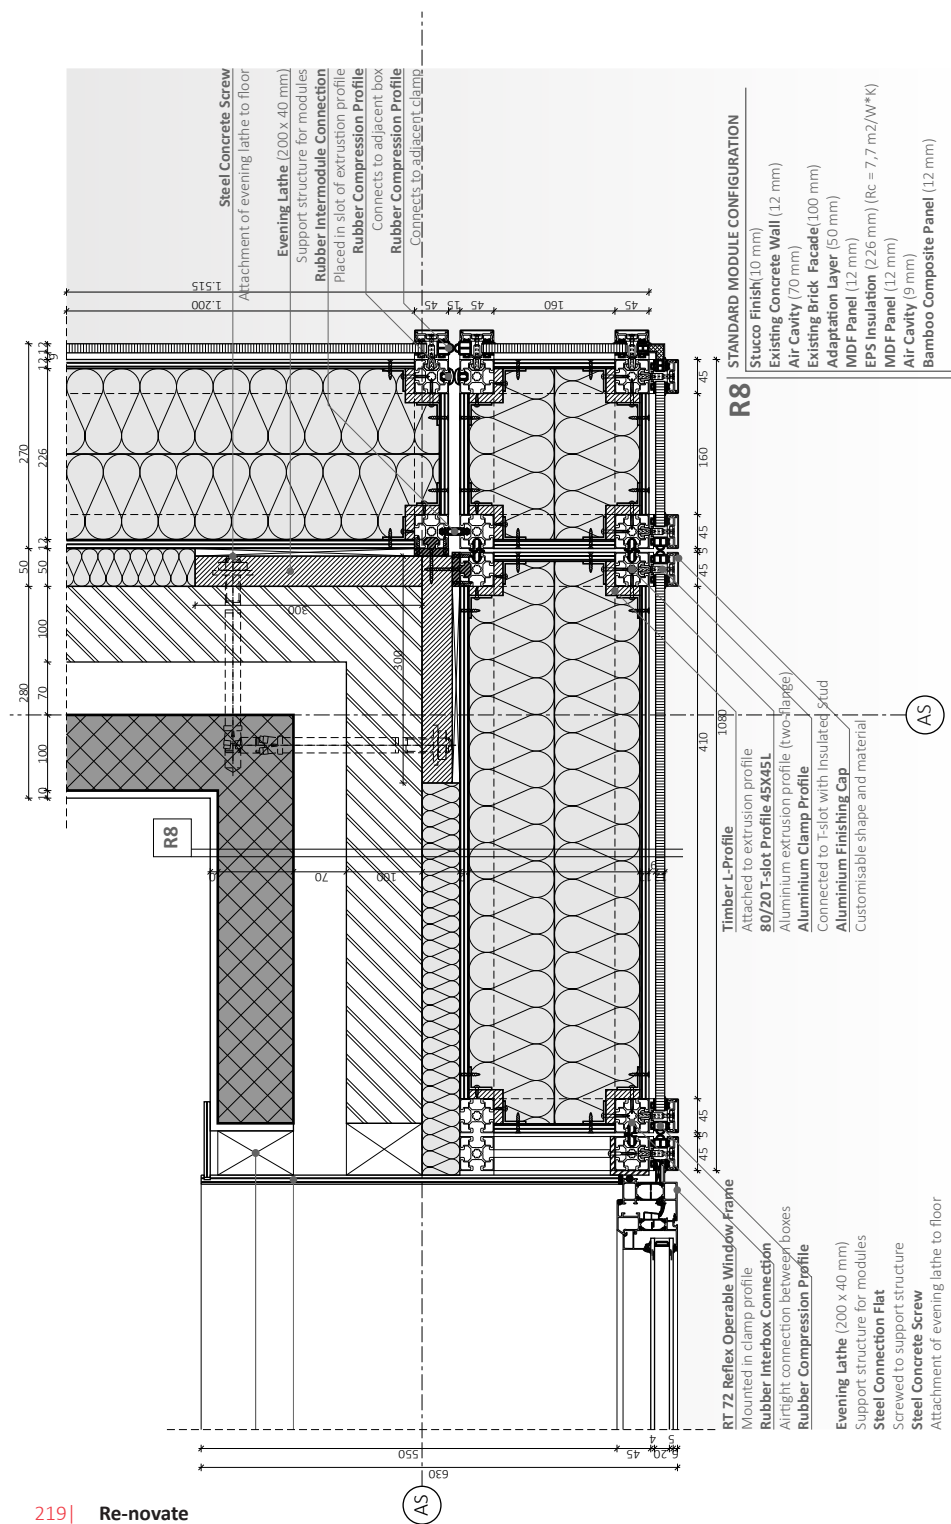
Detail / 1:10 / Horizontal / Corner Connection (own illustration).
